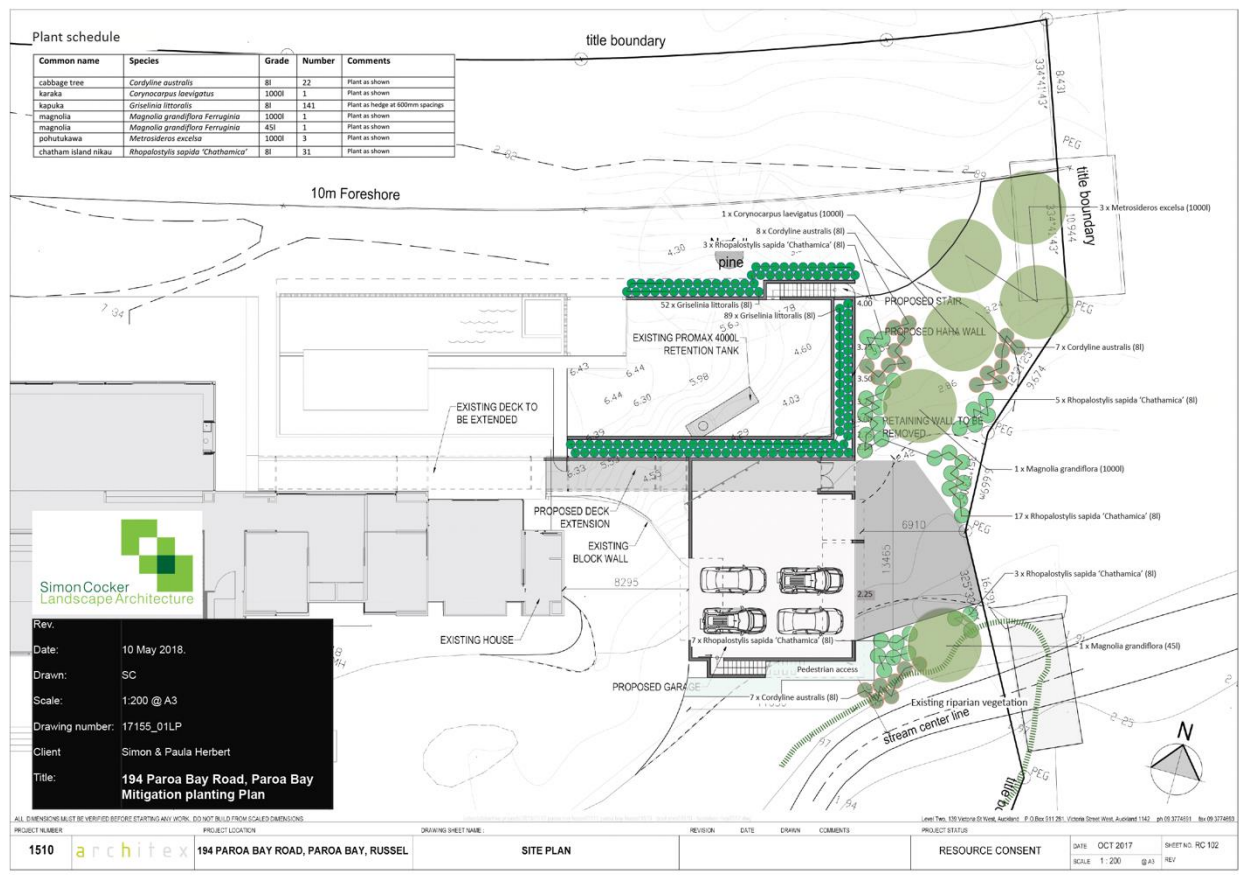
Planting Plan (Source: Simon Cocker Landscape Architects)
